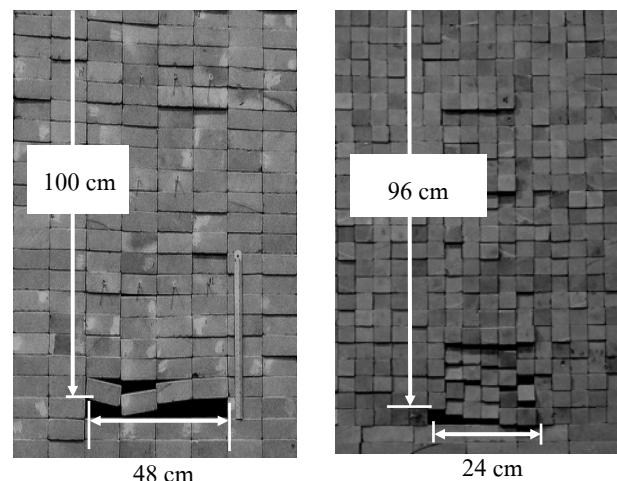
Examples of physical models showing roof failure after opening widths exceed their maximum unsupported spans
